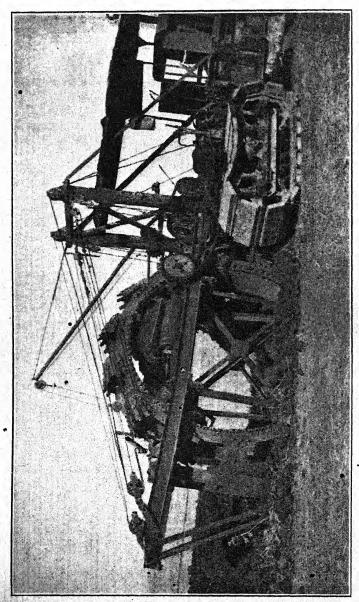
BUCKEYE TRENCHER IN COTTON SOIL. SYRIA
